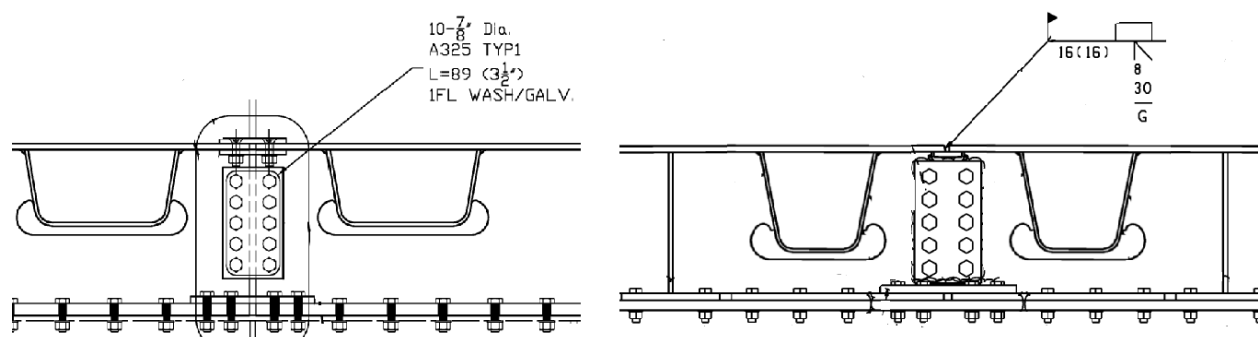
Bolted longitudinal joint (Hastings) on left and welded longitudinal joint (Kingston Mills) on right
